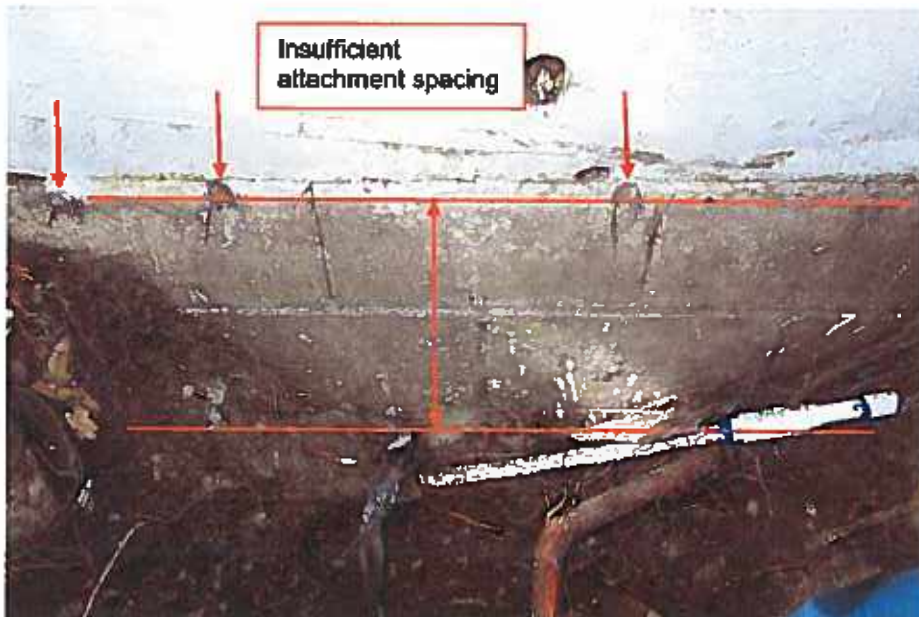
DT location at the CMU foundation wall at the rear of the garage. Note that the wall waterproofing has slipped down - leaving a portion of the wall unprotected. Additionally, note the insufficient attachment spacing.
